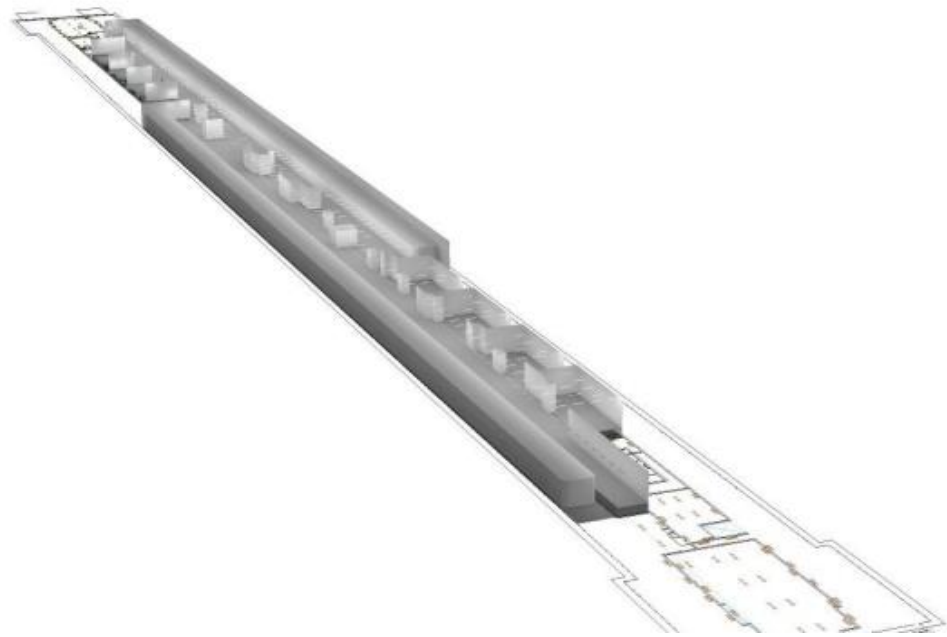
Typical Underground Metro Platform 3D Rendering
